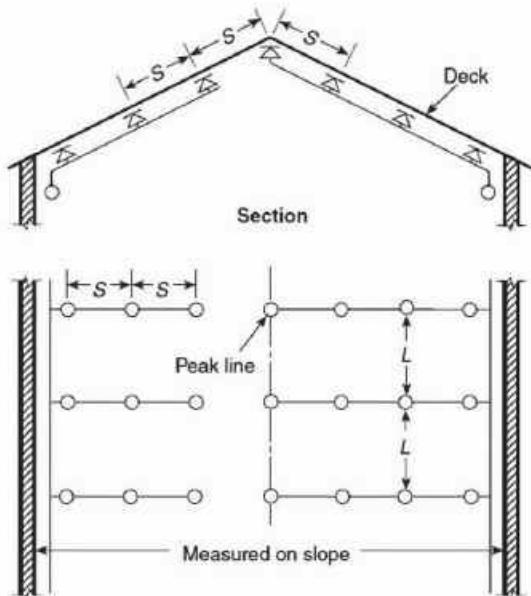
(a) Sprinklers Under Pitched Roofs with Sprinkler Directly Under Peak; Branch Lines Run Up the Slope.
